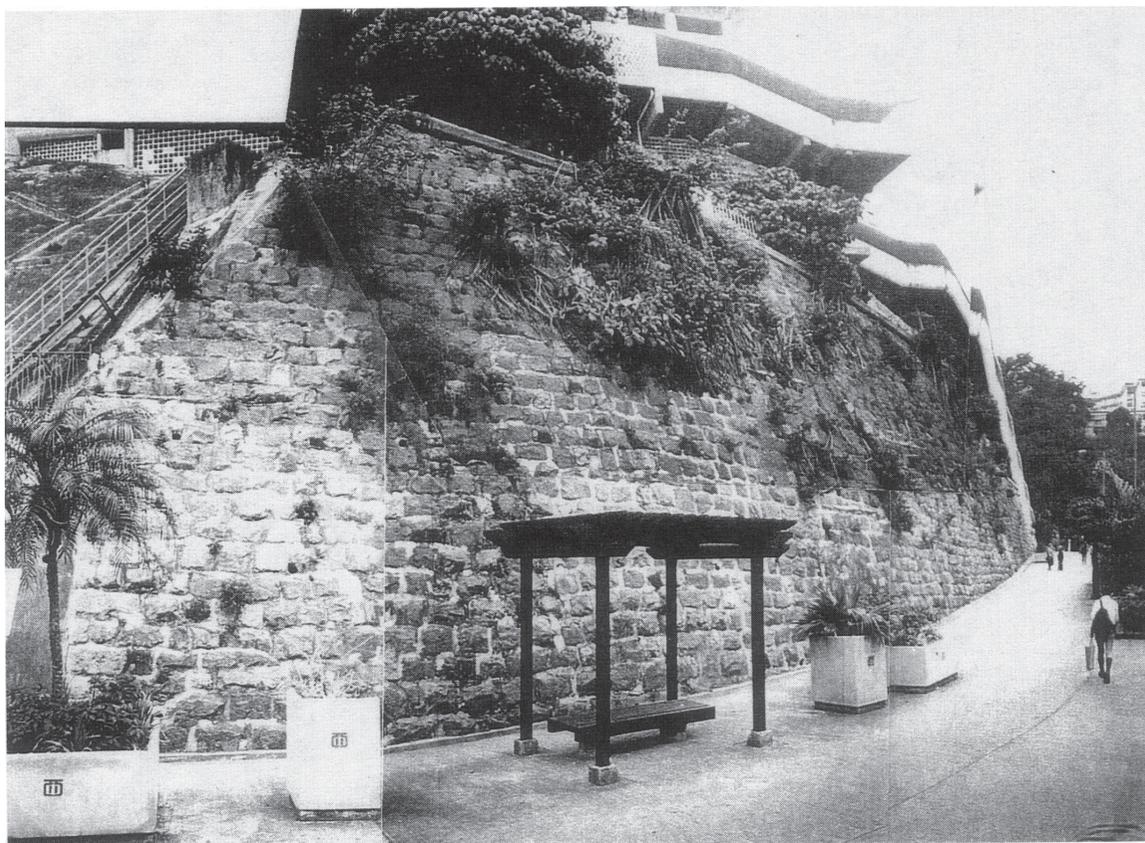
Masonry wall 11SW-A/R309 in January 1991
